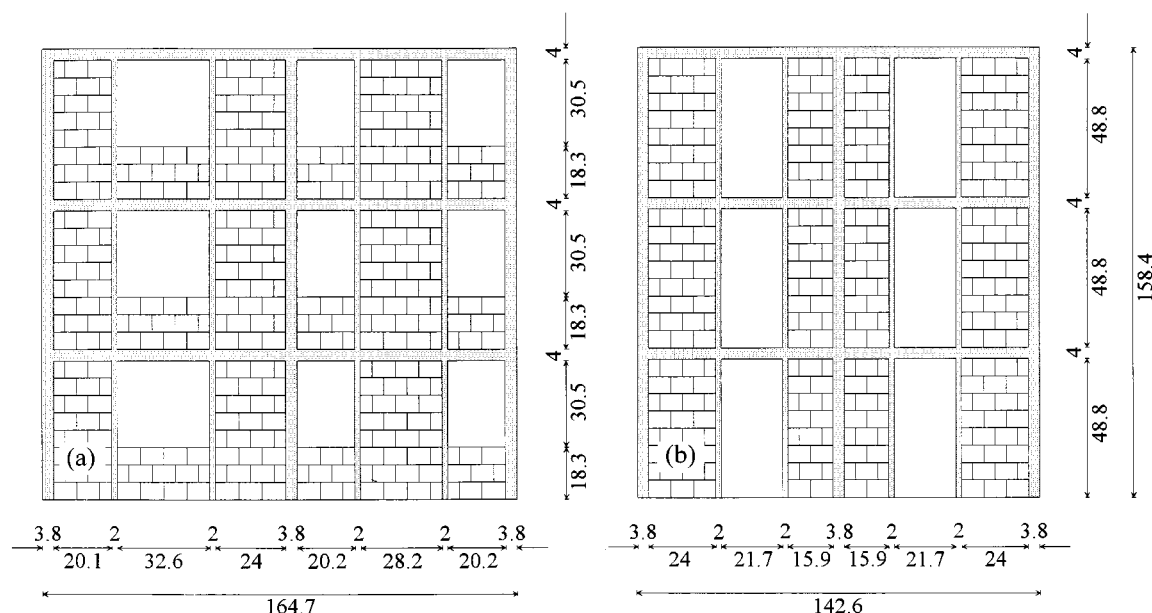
Disposition of tie-columns and dimensions of models in elevation. Shear walls A and C (a) and (b) shear wall 1 (in cm)
